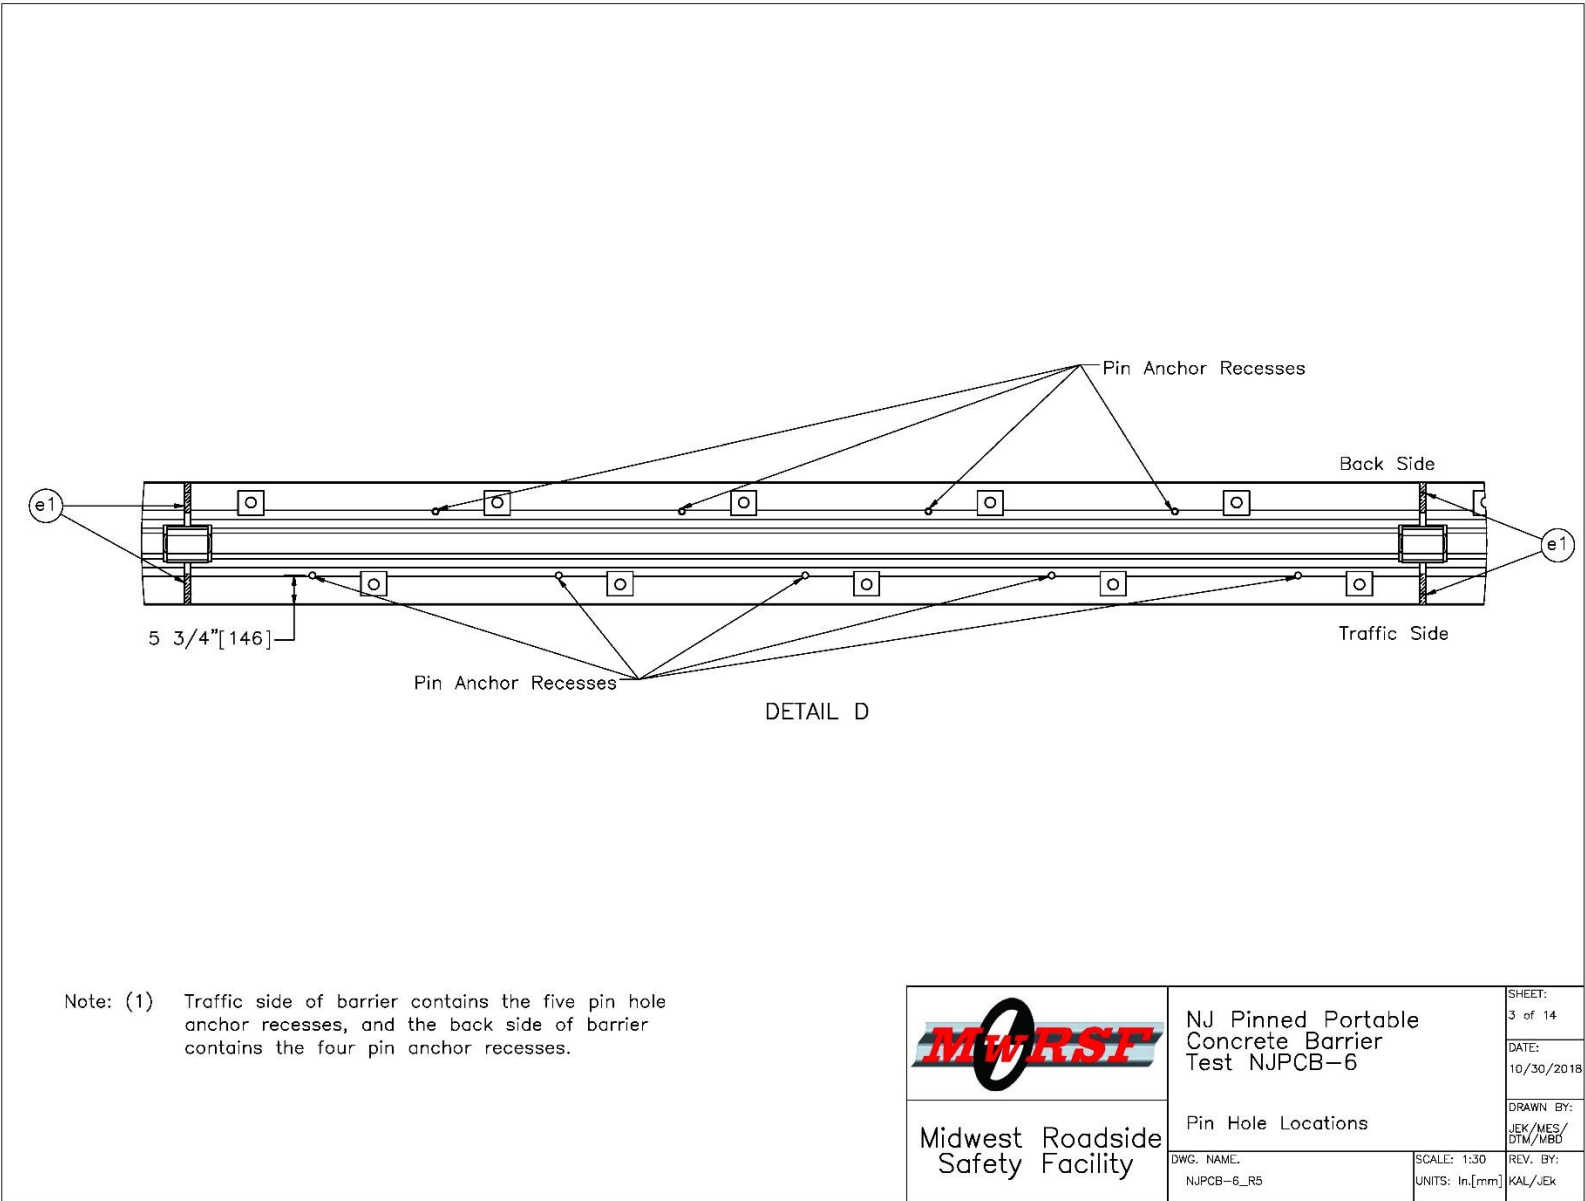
PCB Pin Anchor Locations, Test No. NJPCB-6
